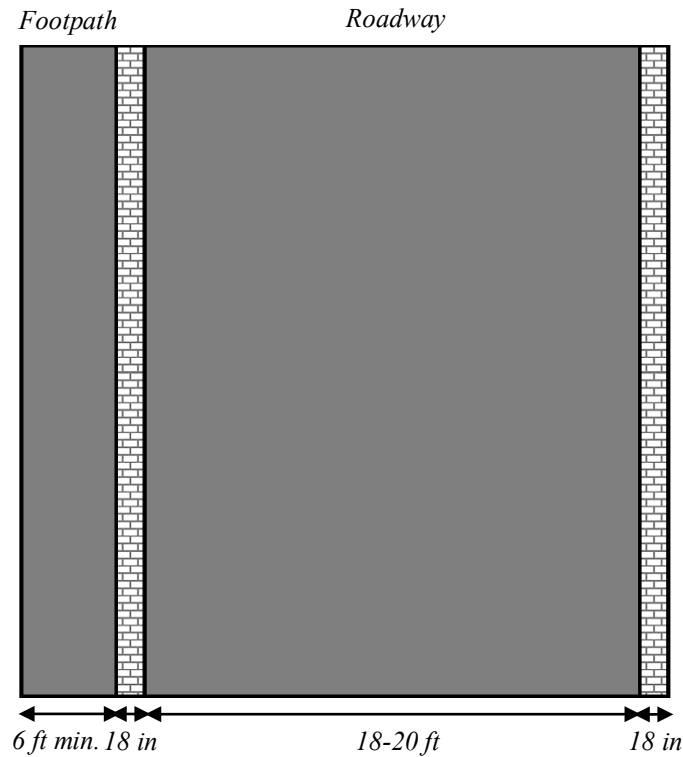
Cross-section of a Local Flow Street with Separate Pedestrian Facility, constrained right-of-way
